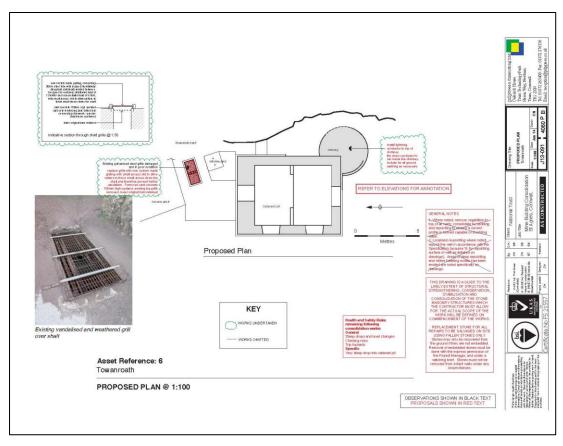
Plan of Wheal Coates Towanroath pumping engine house and detail of shaft.
